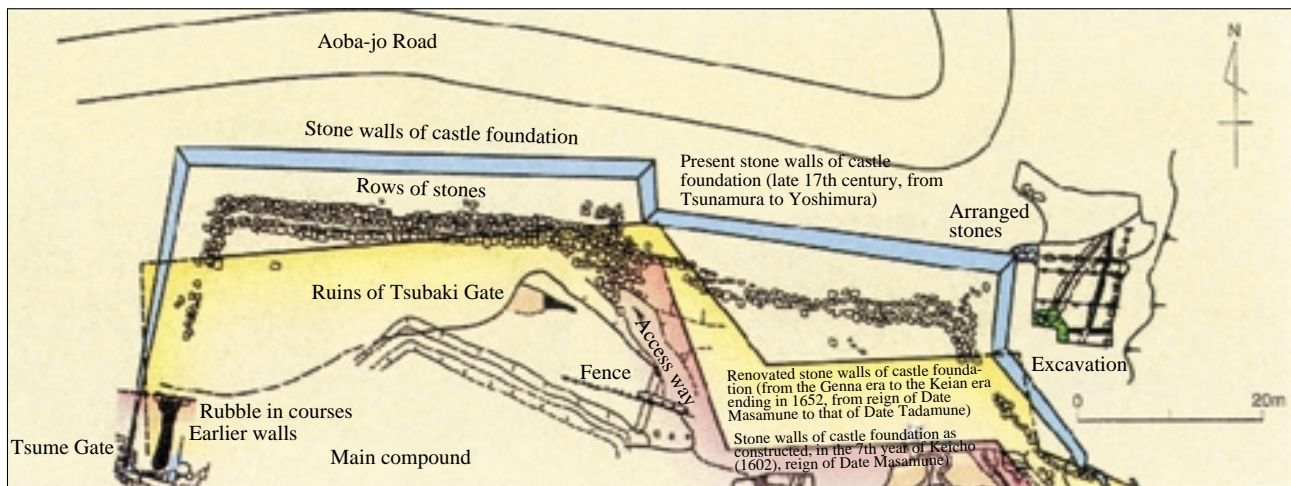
Plan of stone foundation walls and uncovered rows of stones
